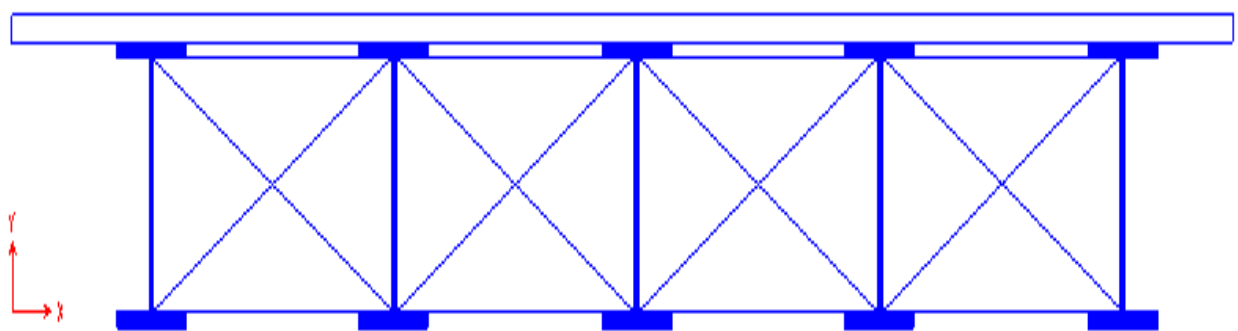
Composite bridge-concrete slabs over multi-steel I-girder bridges
